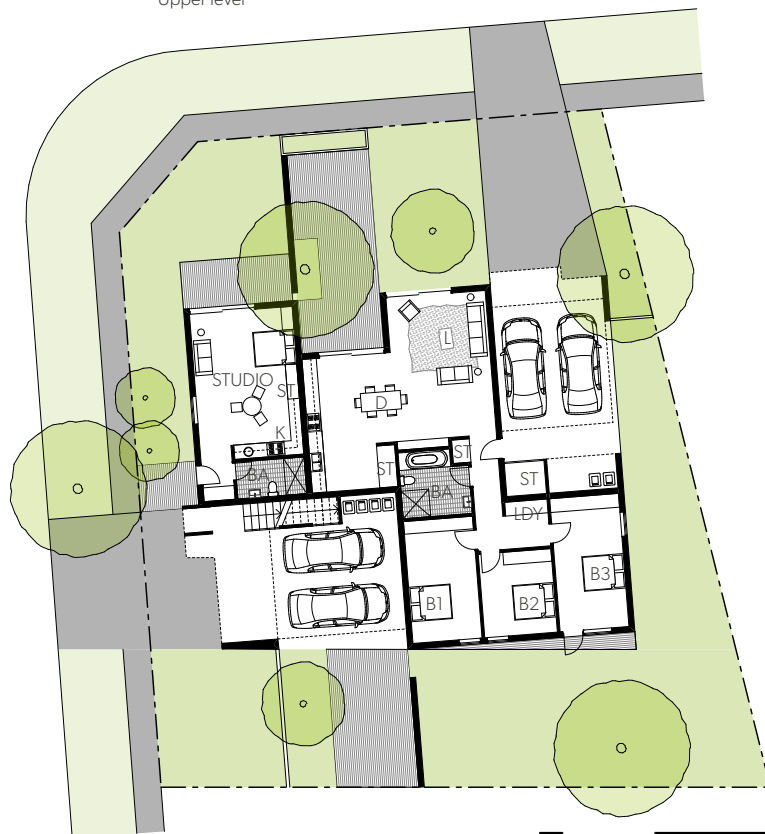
Sample plan of manor house with four dwellings and parking accessed from the rear laneway or street
